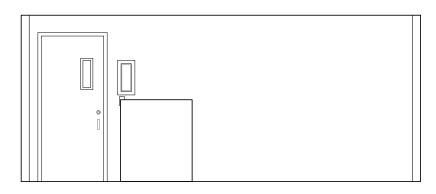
[Above] - Author, *The Stair - Plan/Elevation*, 2021. Fig. 52 - [Right] - Author, *The Stair - Prototype Location*, 2021.
